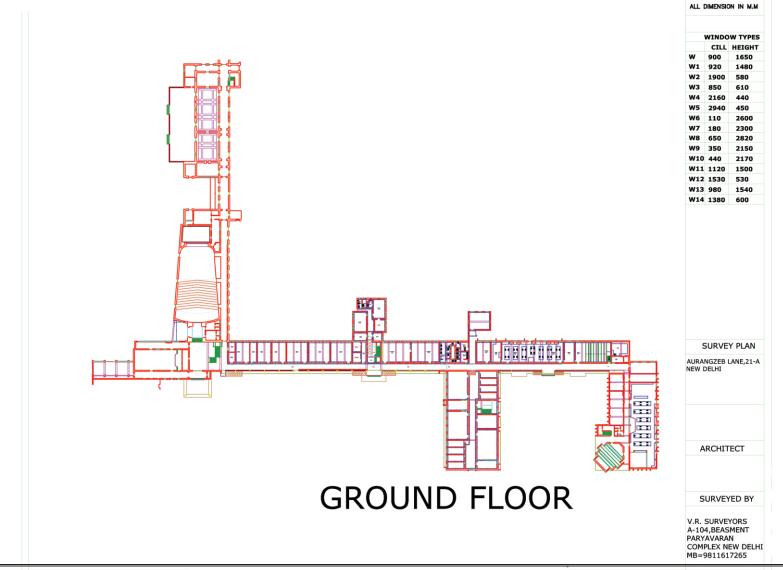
(b): Layout plan of MH Academic Block : Ground Floor
